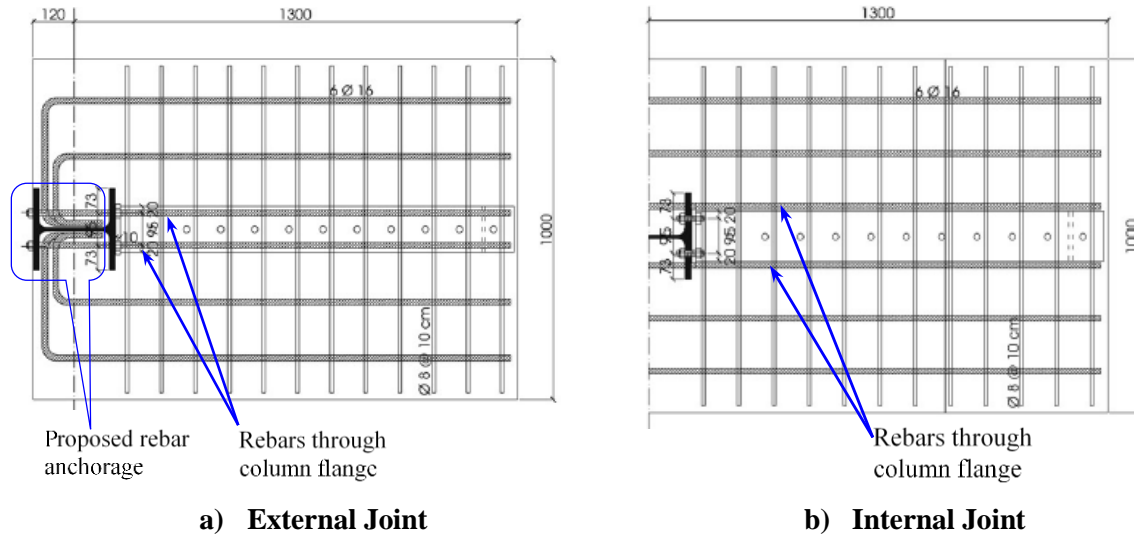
Details of Reinforcement around the Column (Gil and Bayo [25])
